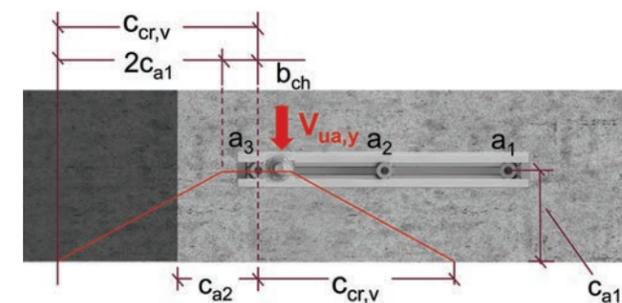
Obtuse corner — perpendicular shear — Plan view.
